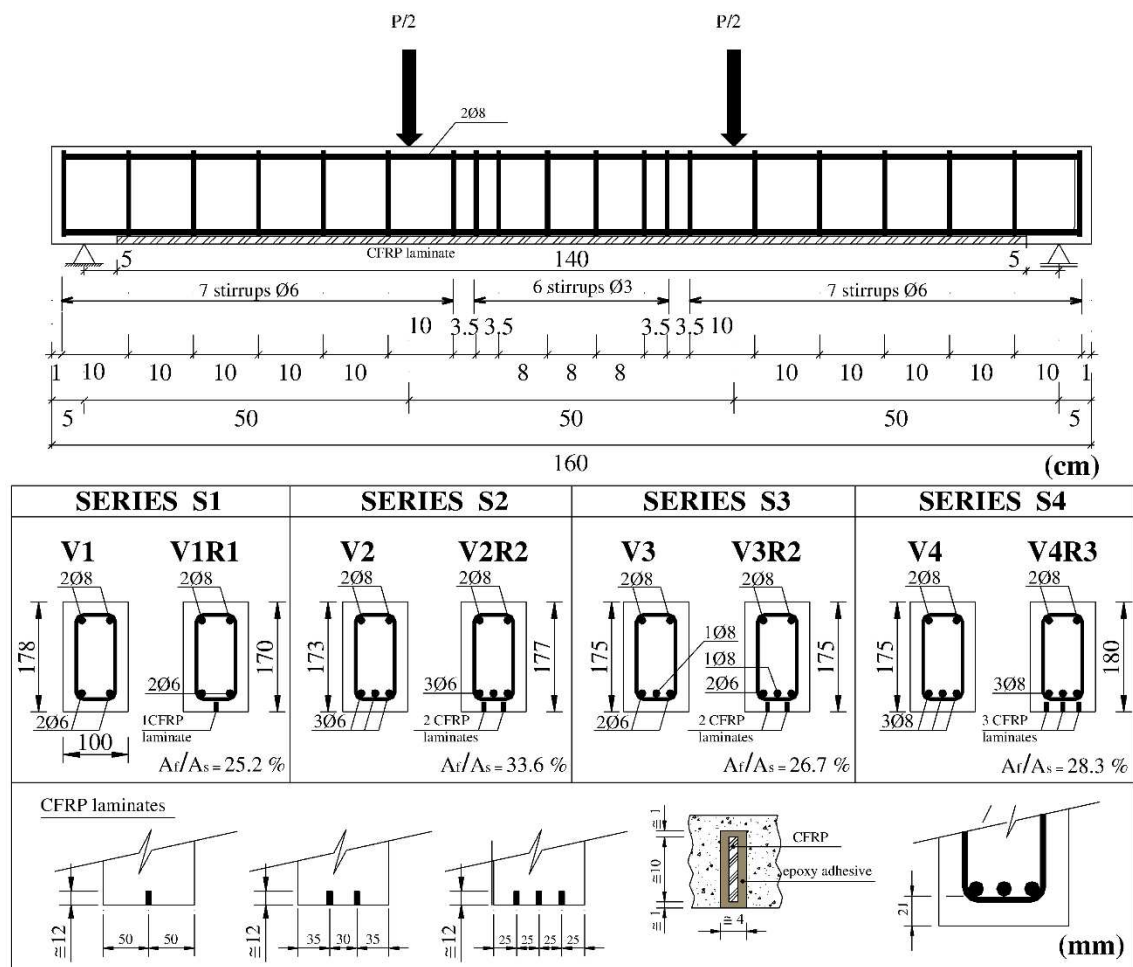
Details of test setup, beams geometry and steel configuration, and the adopted strengthening layouts for the RC beams tested by Barros and Fortes [50]
